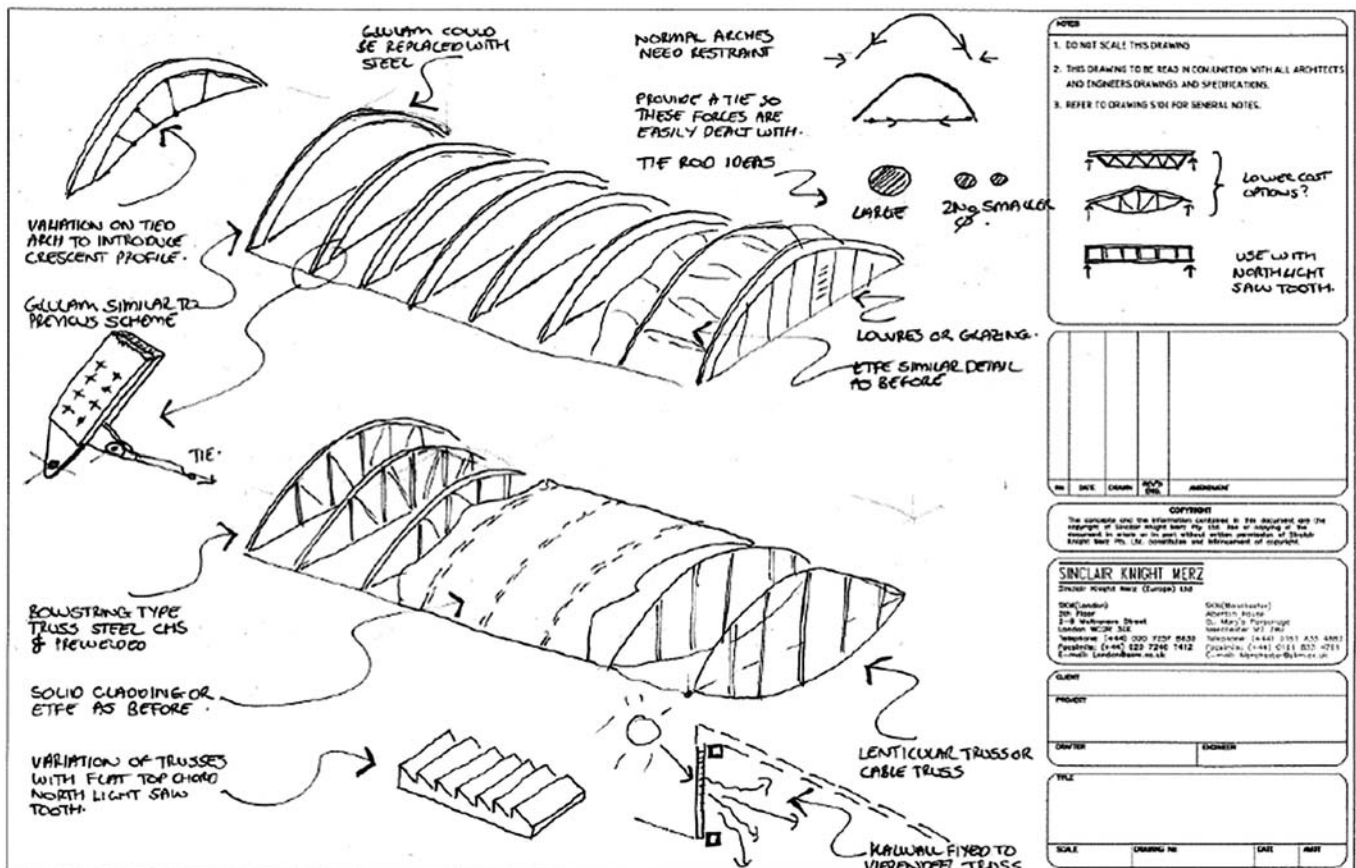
Adopted roof structure to Bradford Academy (tied steel arch with ETFE pillows)
